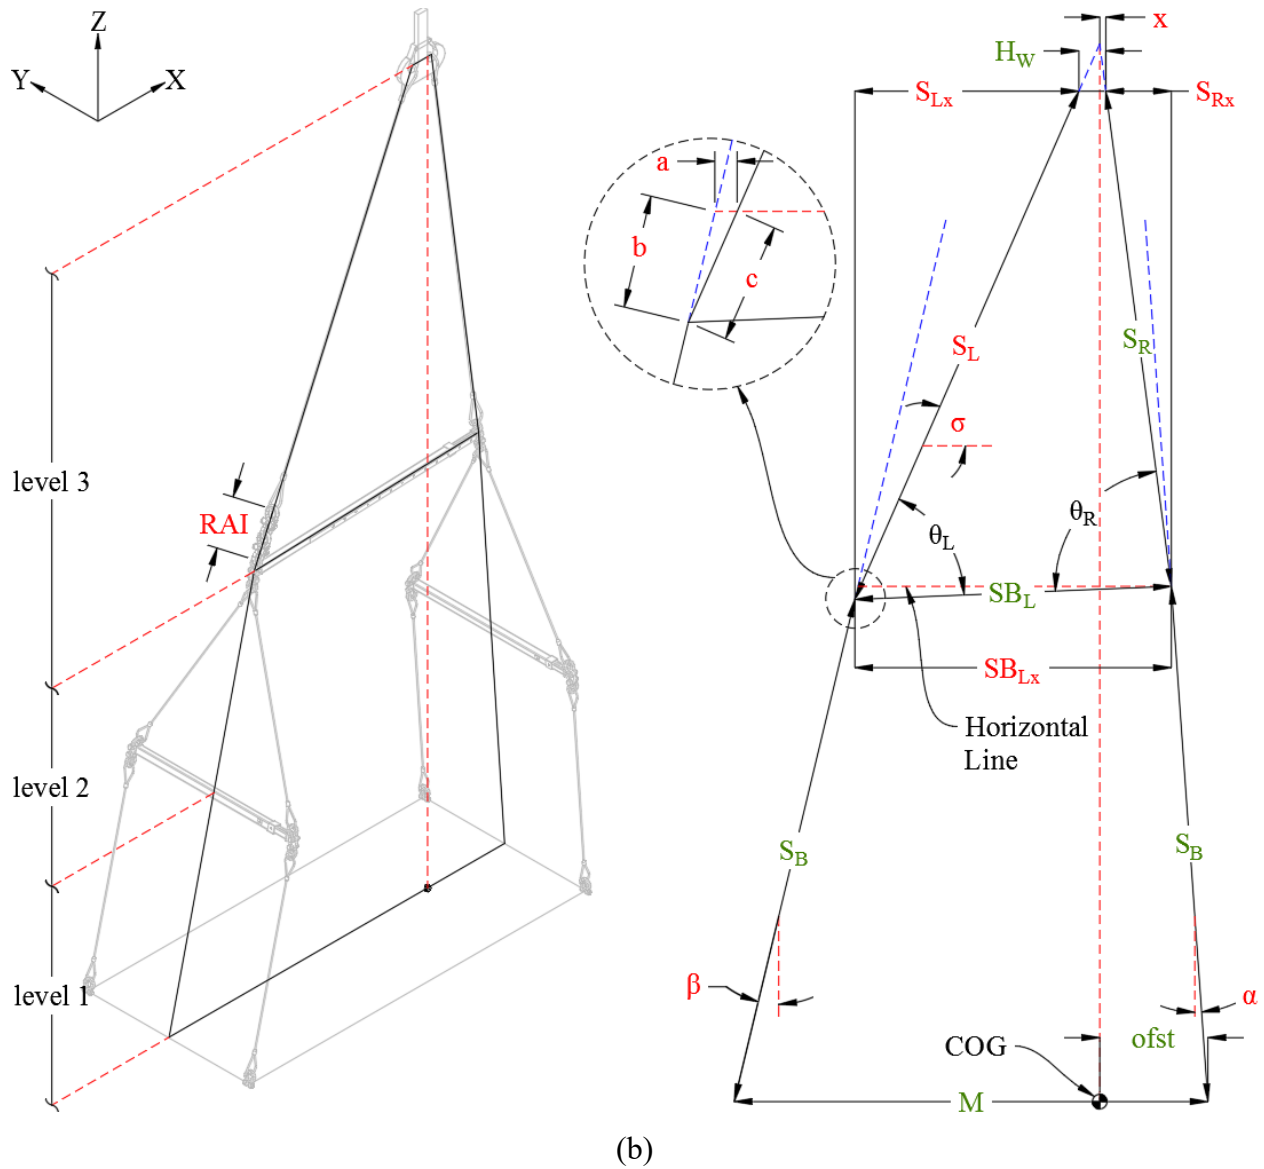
Two-dimensional drawing of a 4-point pick rigging assembly
